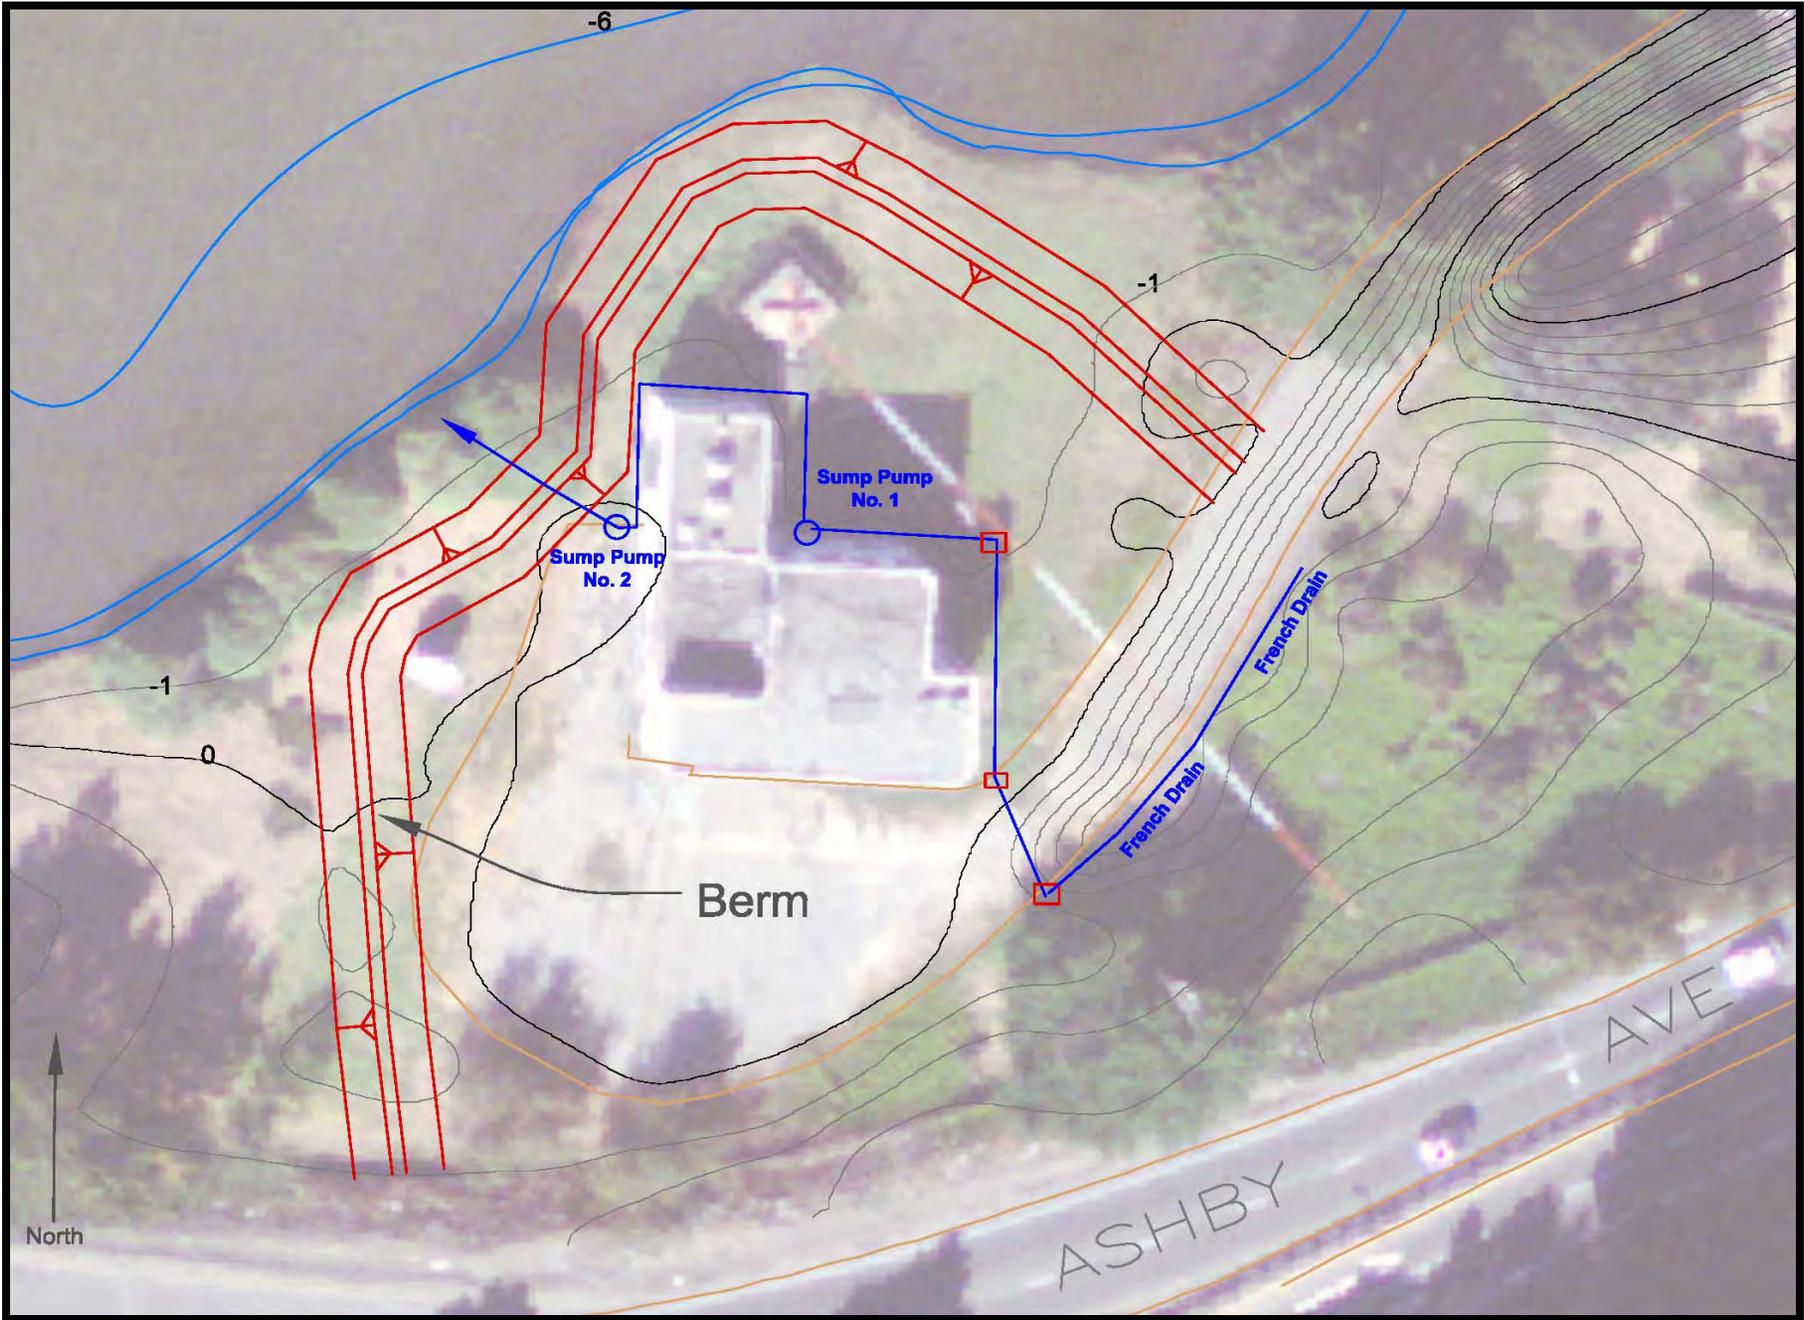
Proposed Berm to Protect Radio Transmitter Building from Flooding
